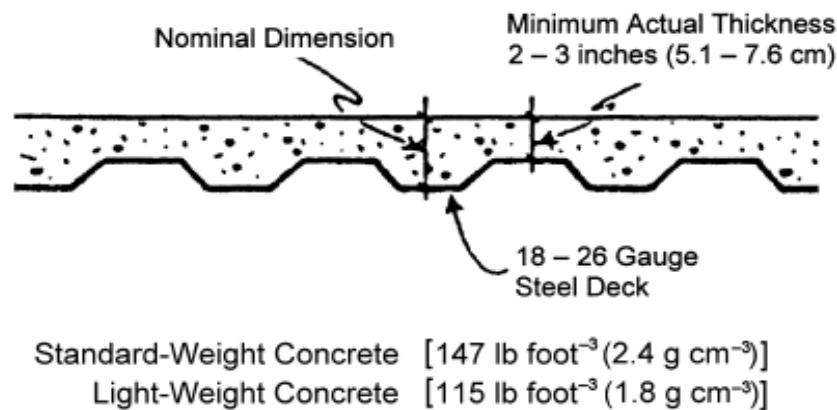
Schematic of a typical concrete floor slab poured on a steel deck. The minimum thickness should be used in calculating the barrier thickness.
